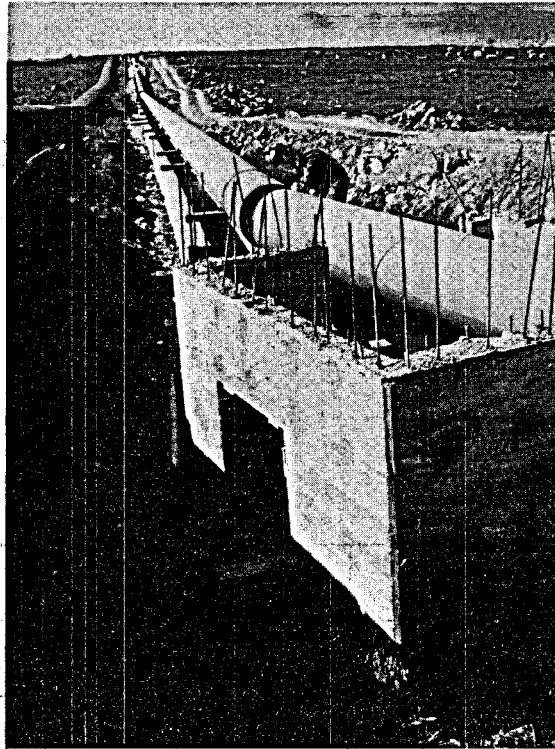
New pipeline from Reykir to Reykjavik 28" diameter pipe in concrete conduit.
